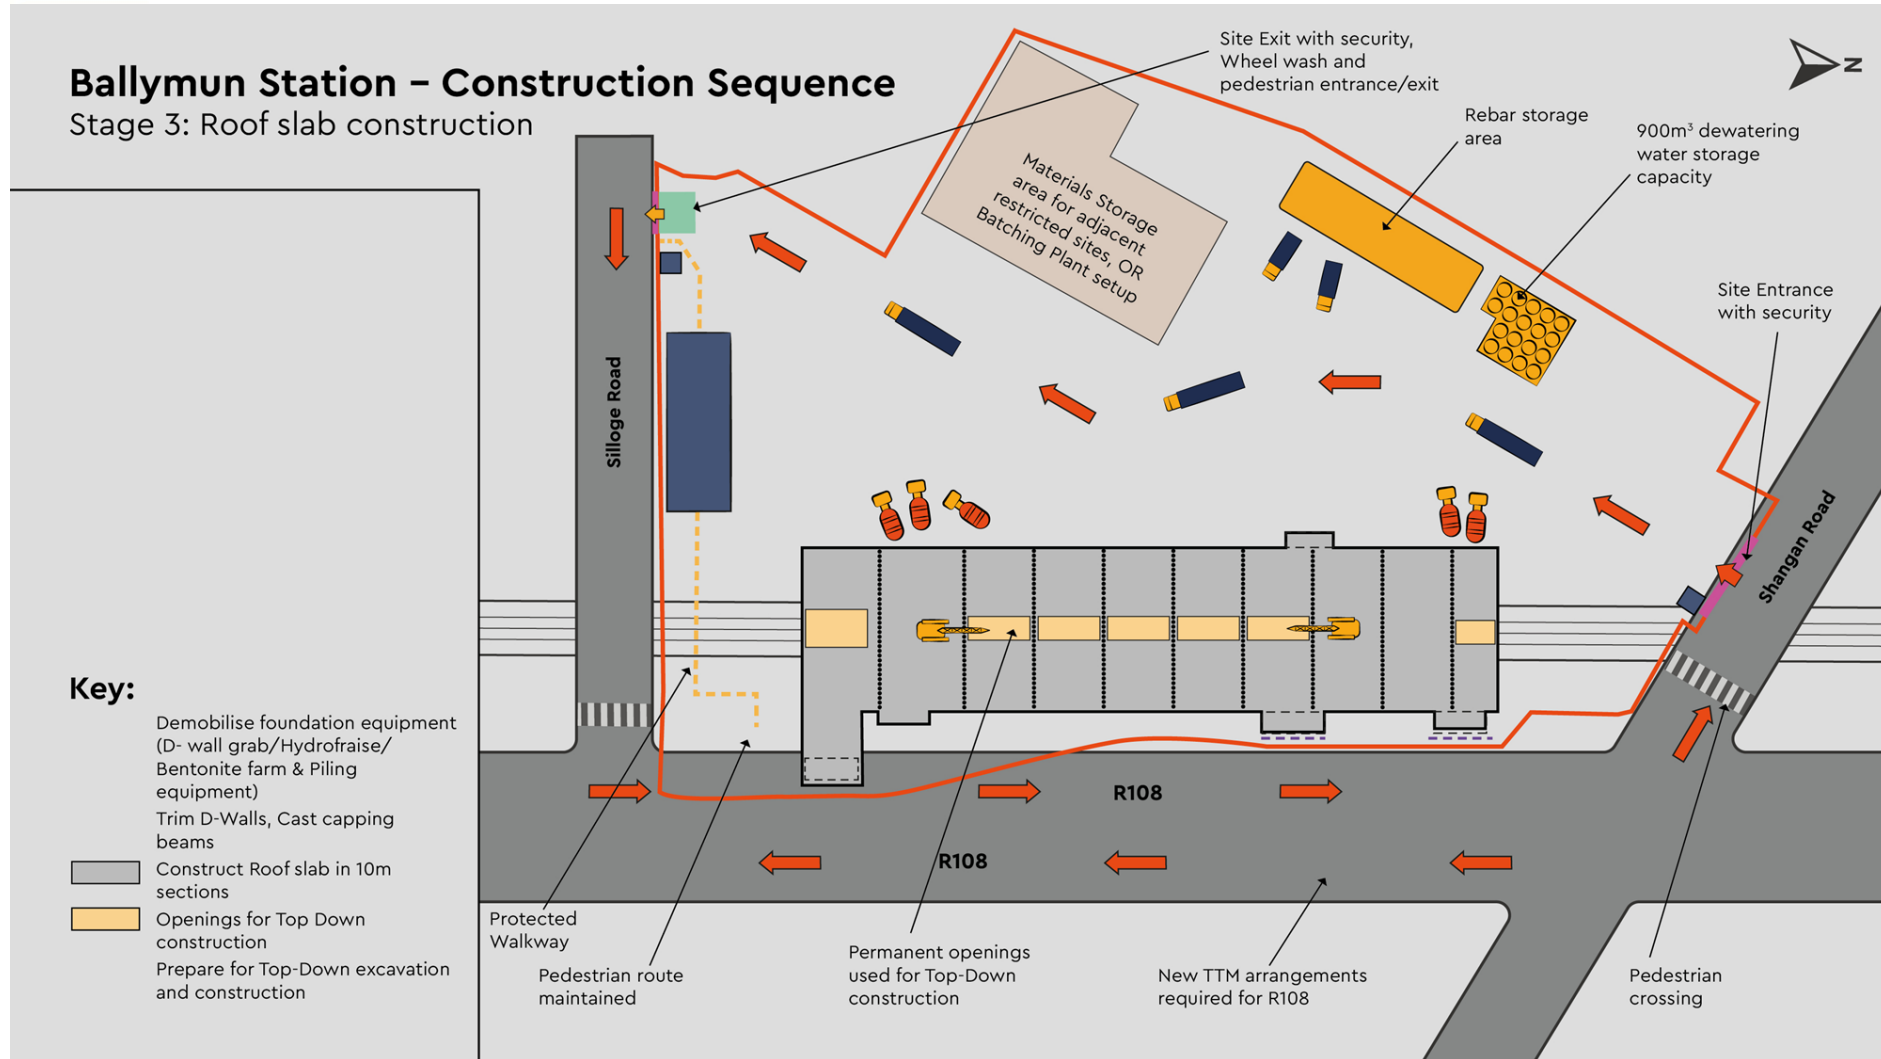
Ballymun Station Stage 3 – Roof Slab Construction
